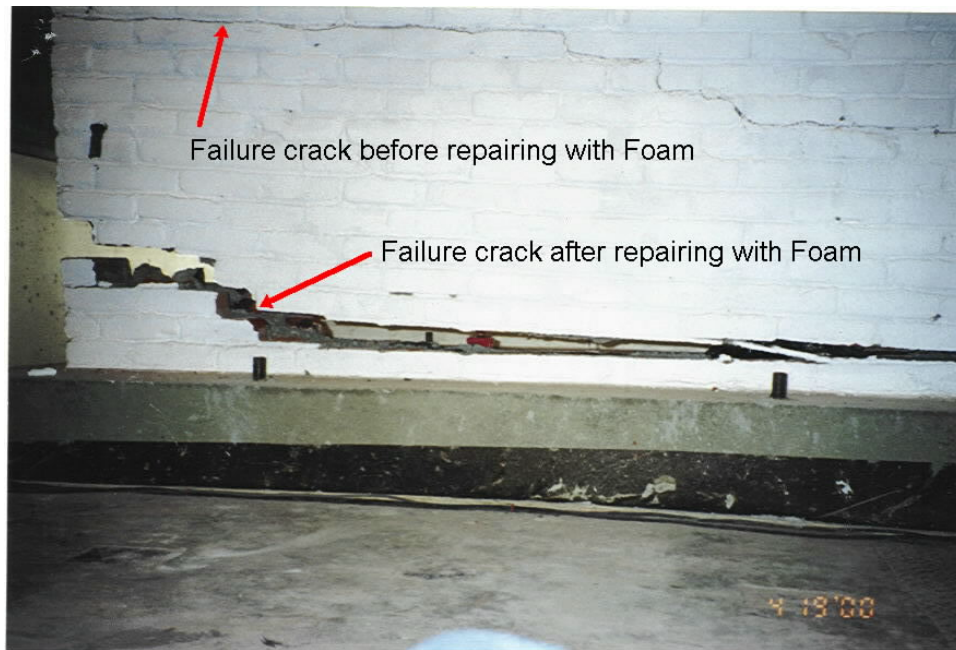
Failure Cracks of the In-Plane Wall Before and After Repairing with Foam
